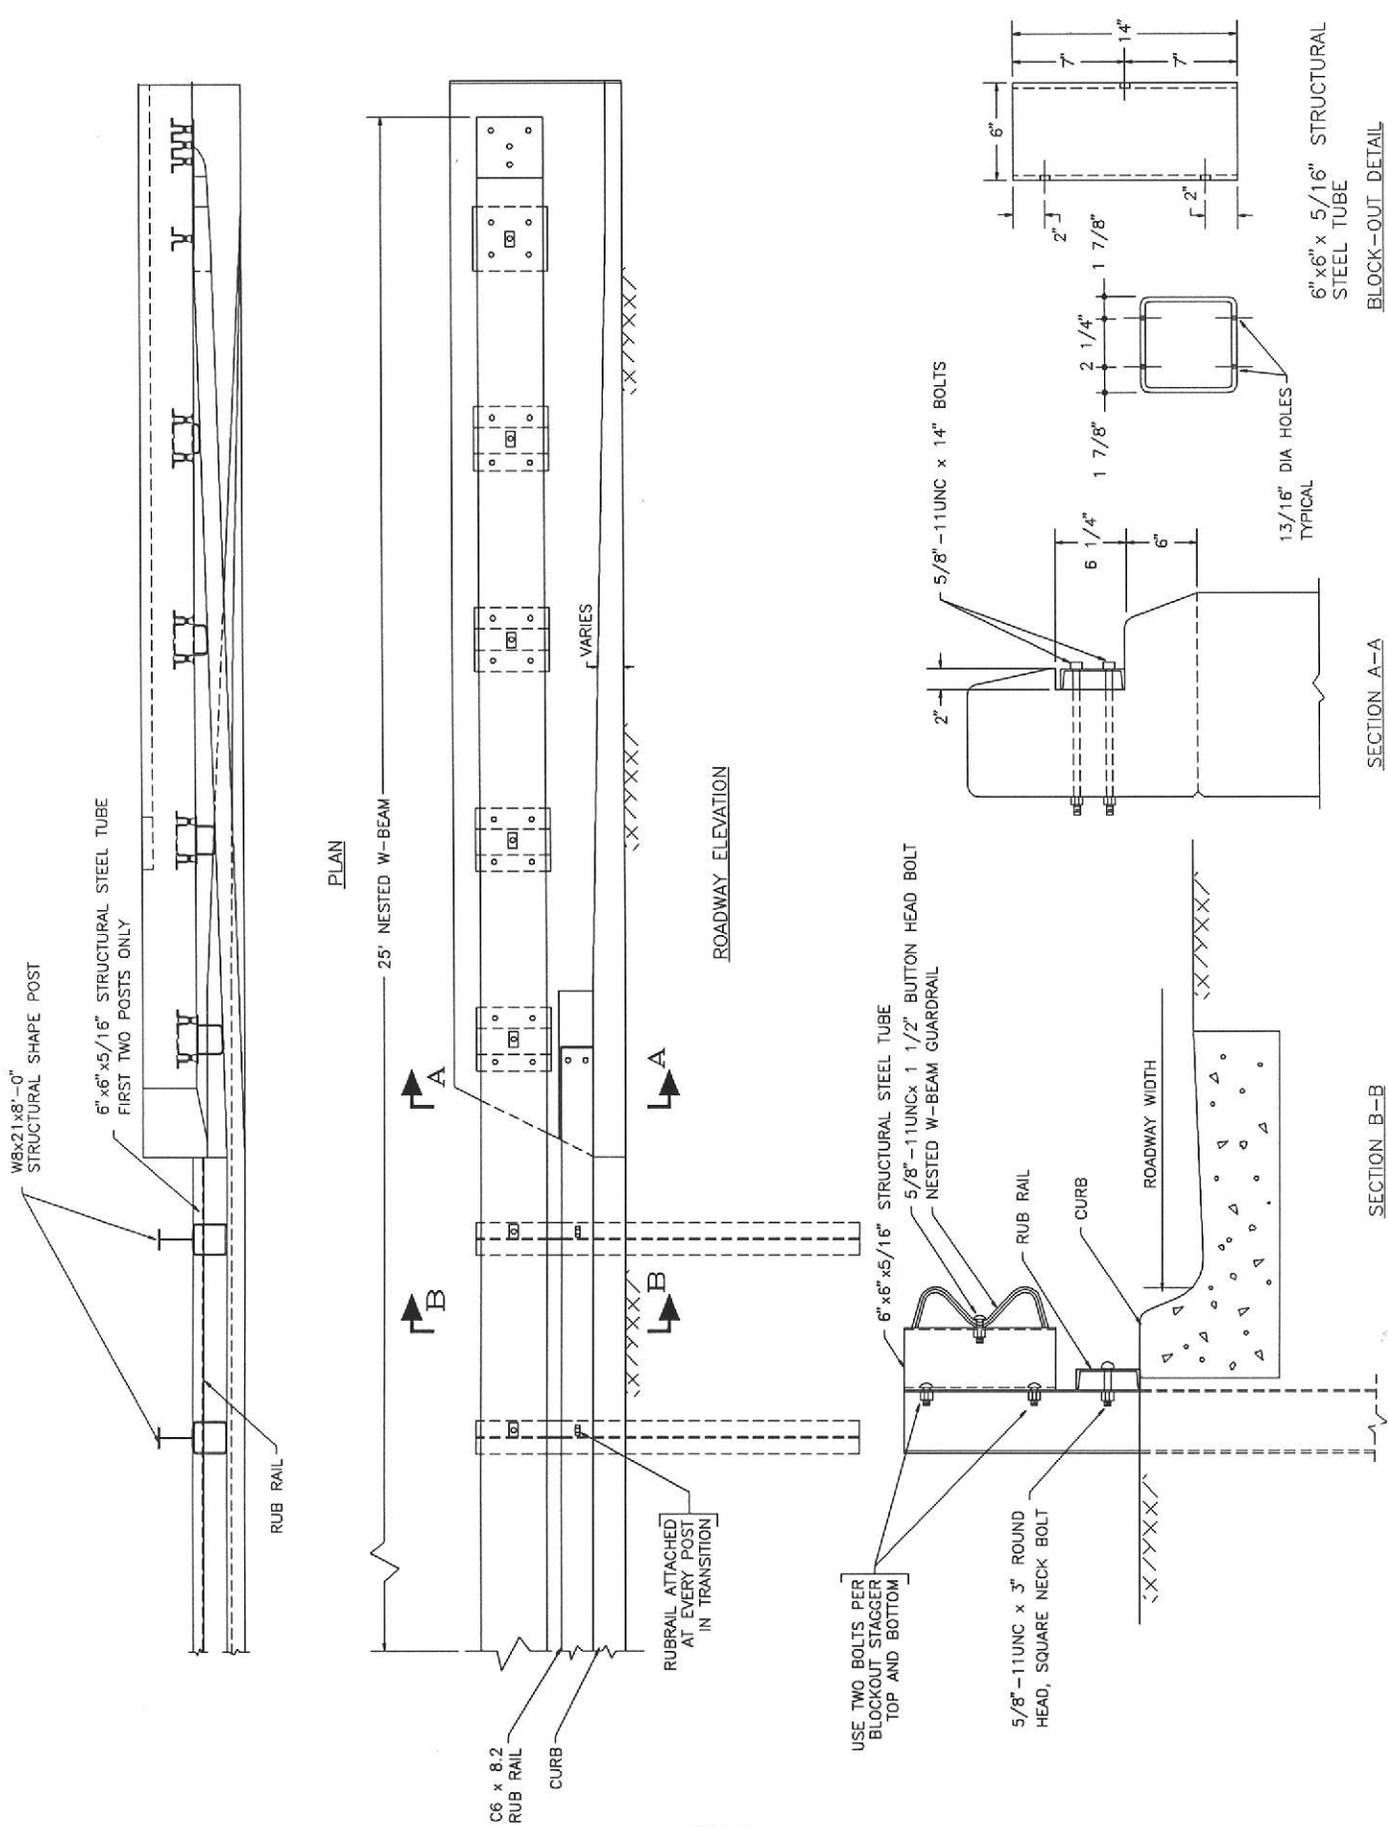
ADOT steel post transition with curb, rubrail, and nested W-beam.
